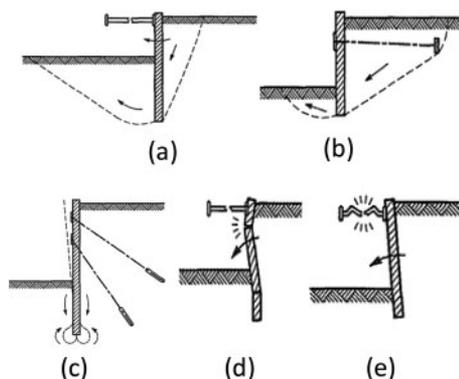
Five failure modes of embedded walls shown in Eurocode 7.
